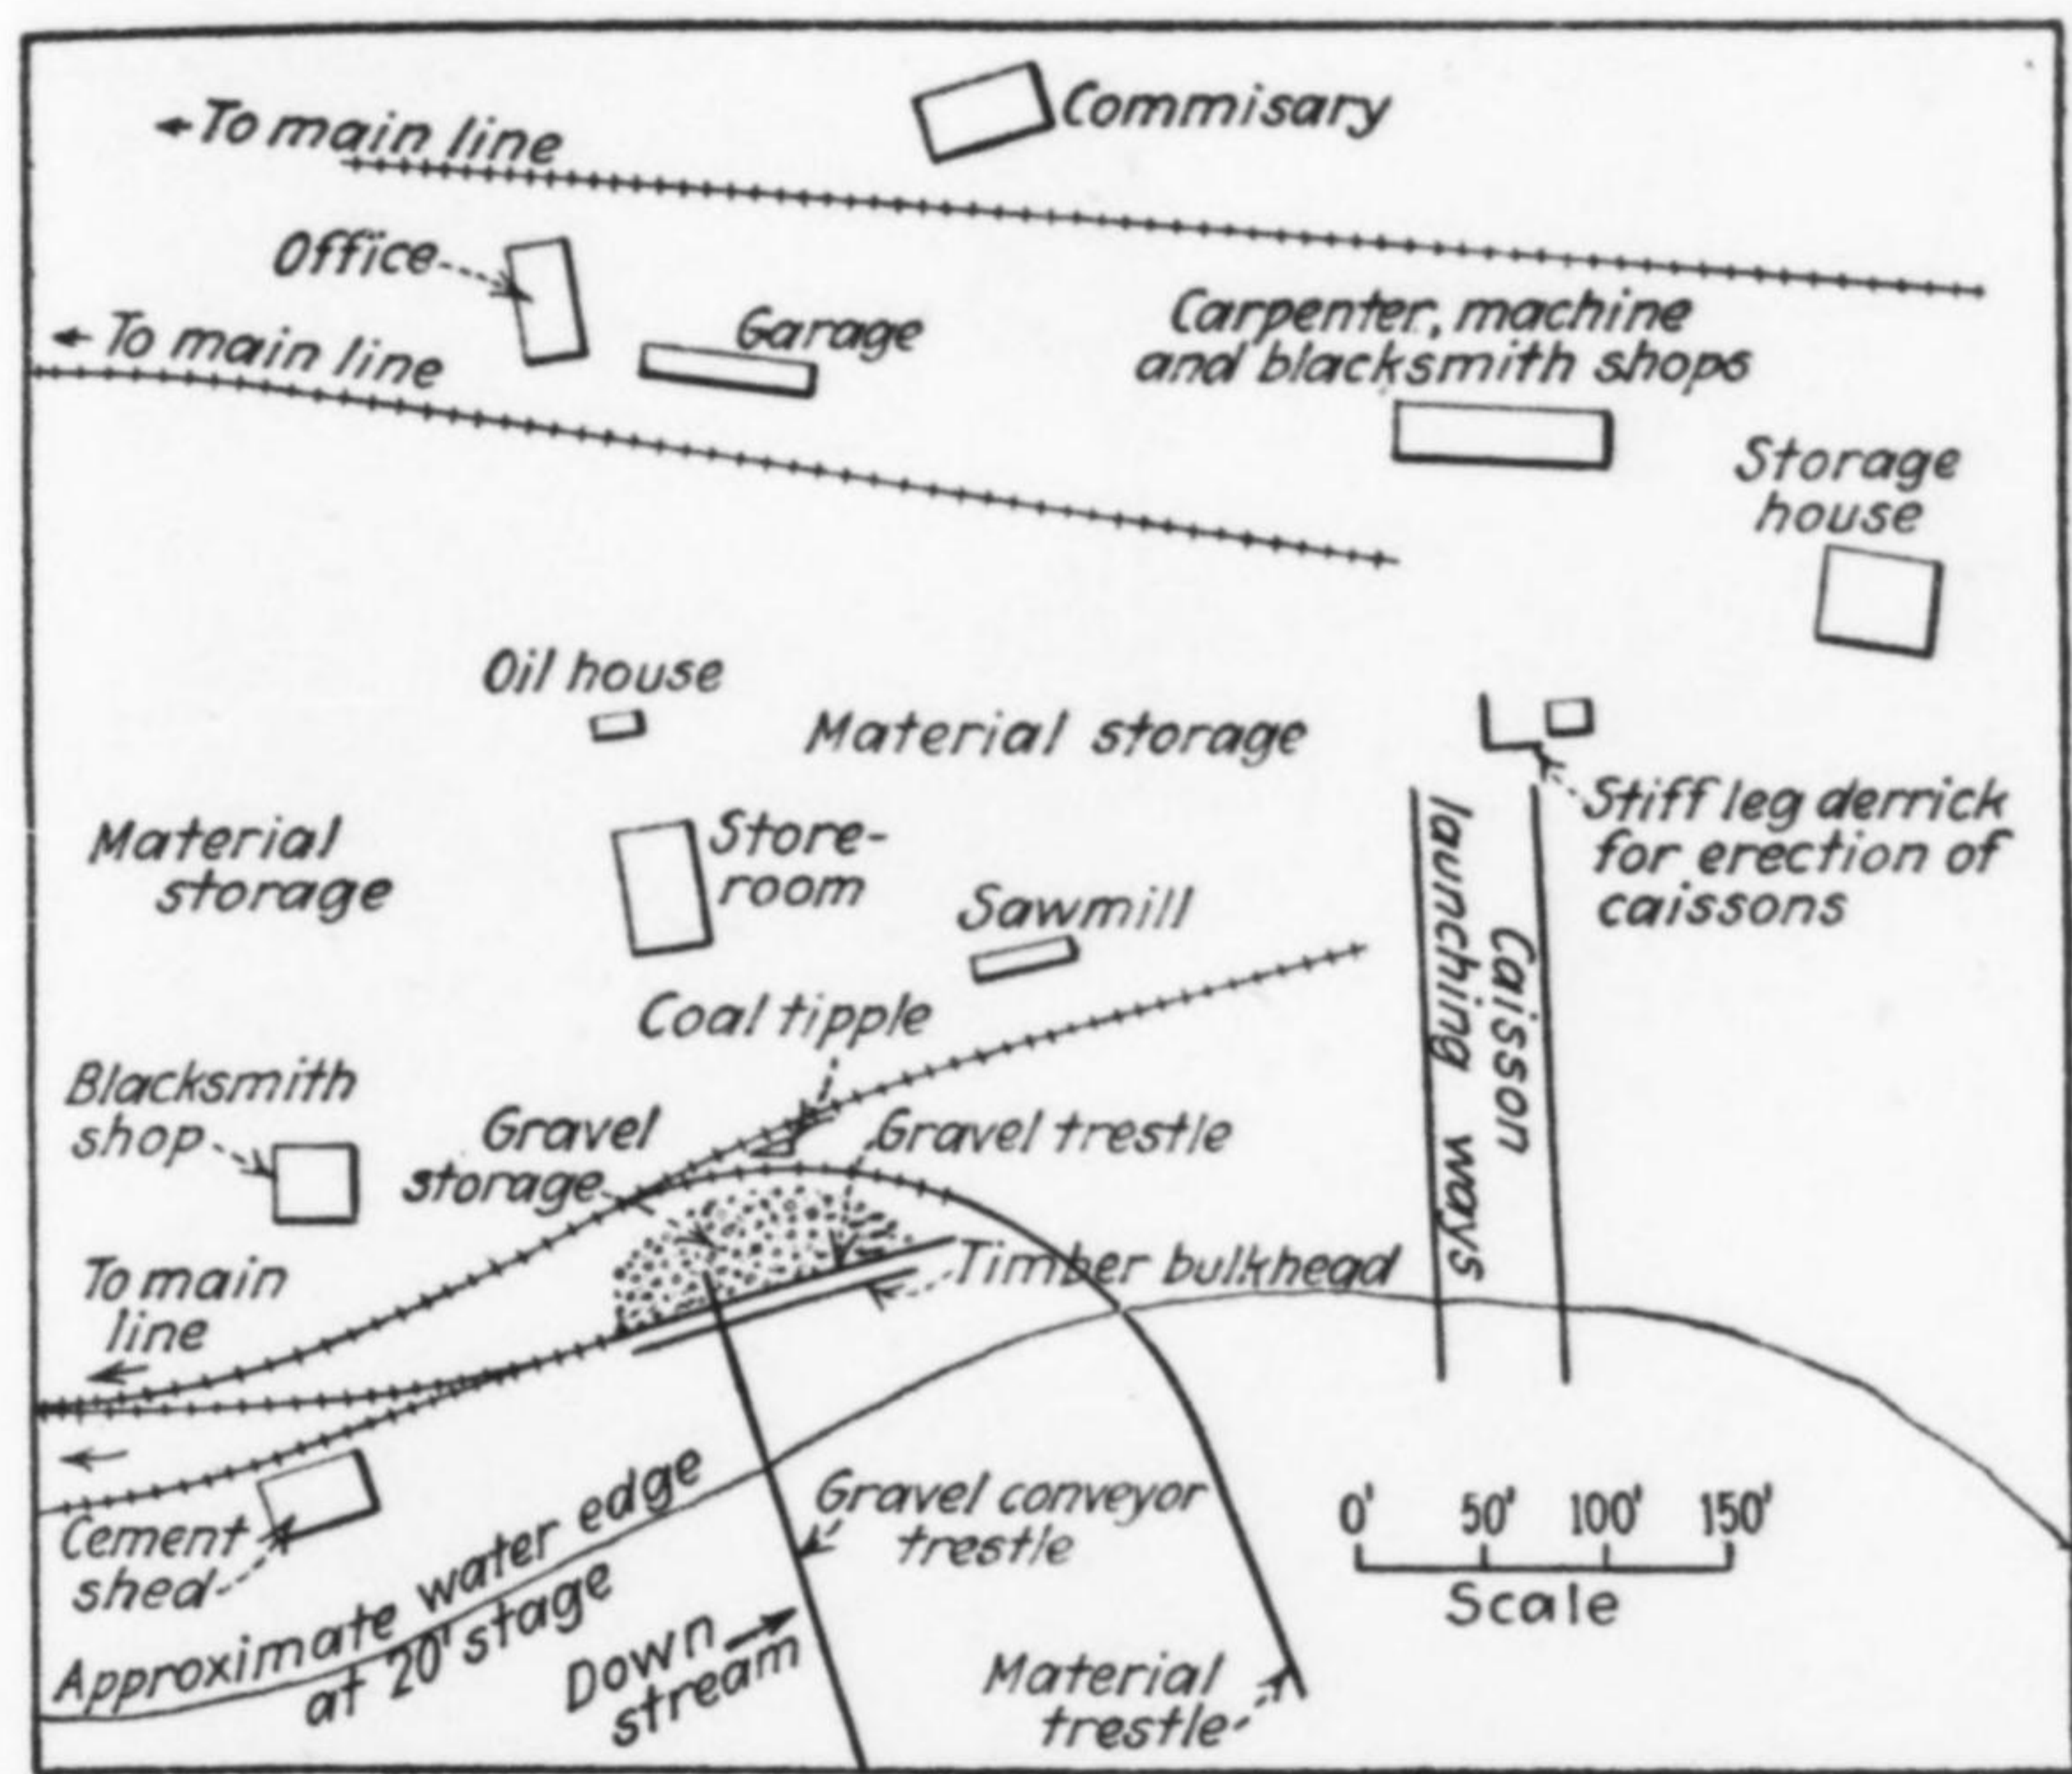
MAP OF THE CENTRAL PLANT LAYOUT ON THE VICKSBURG SIDE
